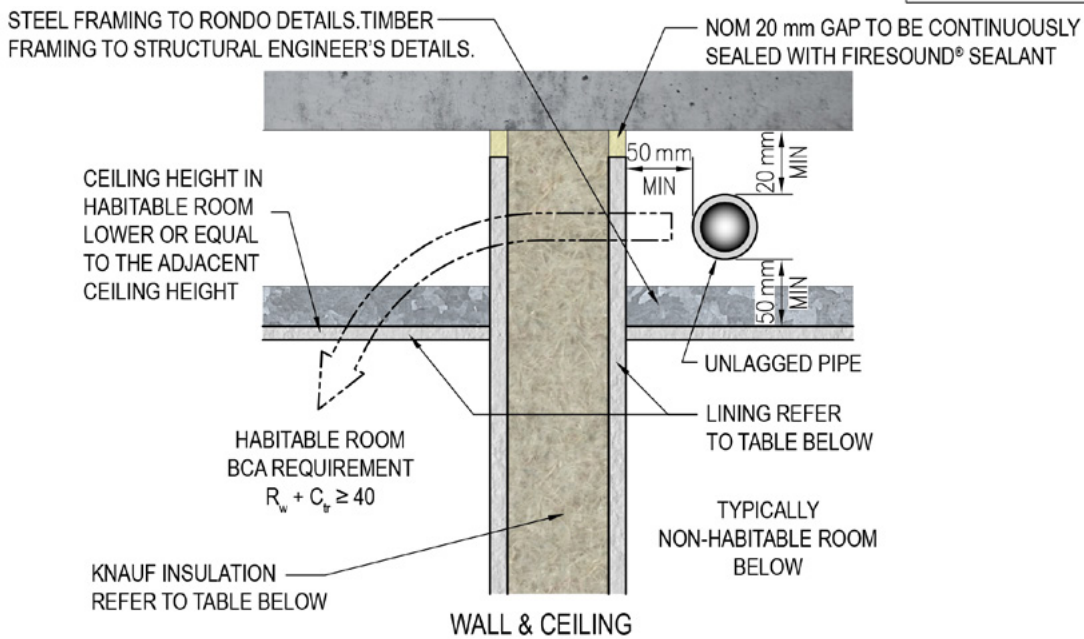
Soil & Waste Pipe Systems - $R_w + C_{tr}$ 40 (No Lagging) Ceiling and Wall Systems
